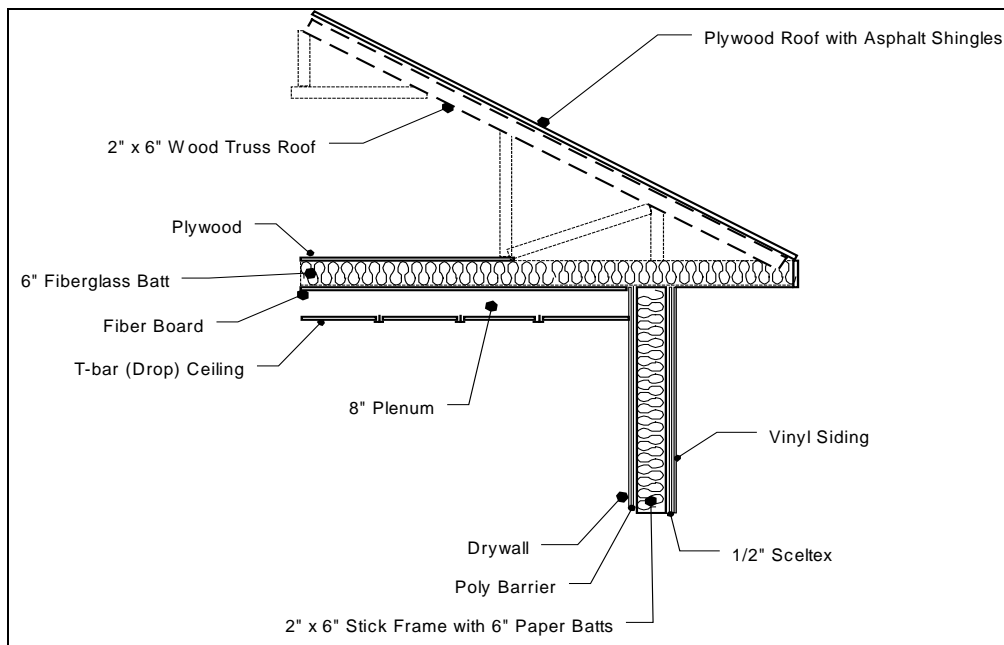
Roof and Wall Sections of the Addition along the Length of the Office Section of the Building
